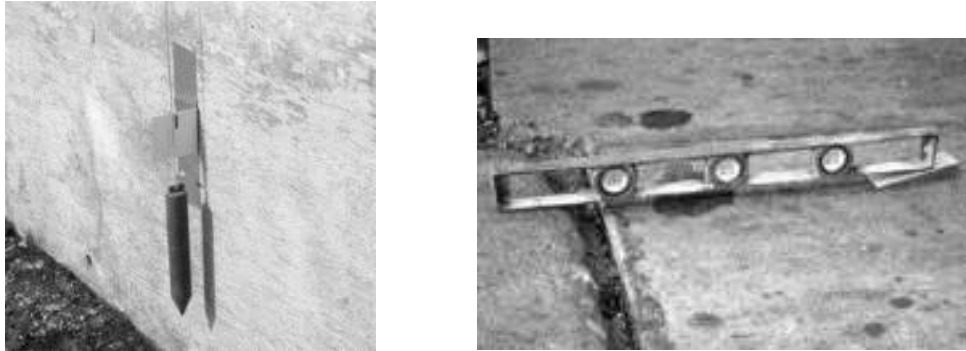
(L) Plumb line suspended from top of structure – (R) Carpenter's level wedged to a position across pavement joint (ASCE, 2010).
